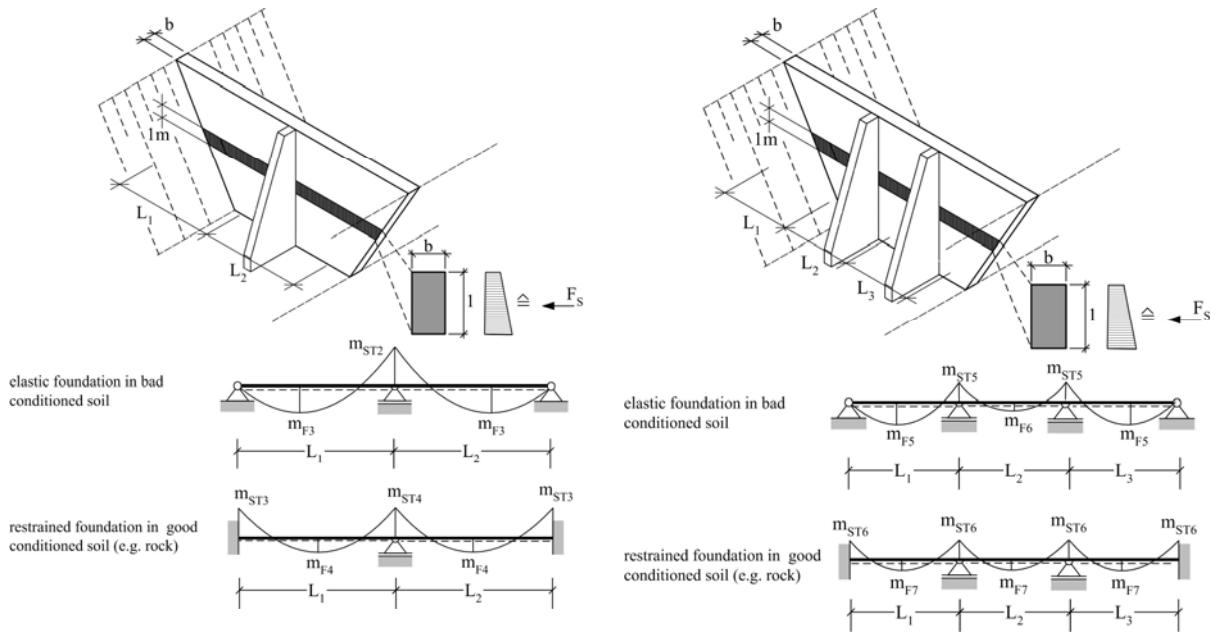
Slab barrier (single solid body barrier) – elastic foundation and restrained foundation and additional slabs
